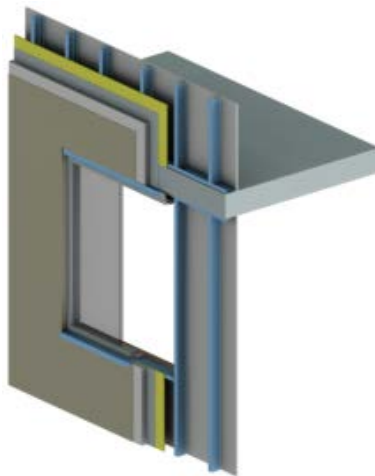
Exterior Insulated EIFS Steel Stud Punched Window Detail
